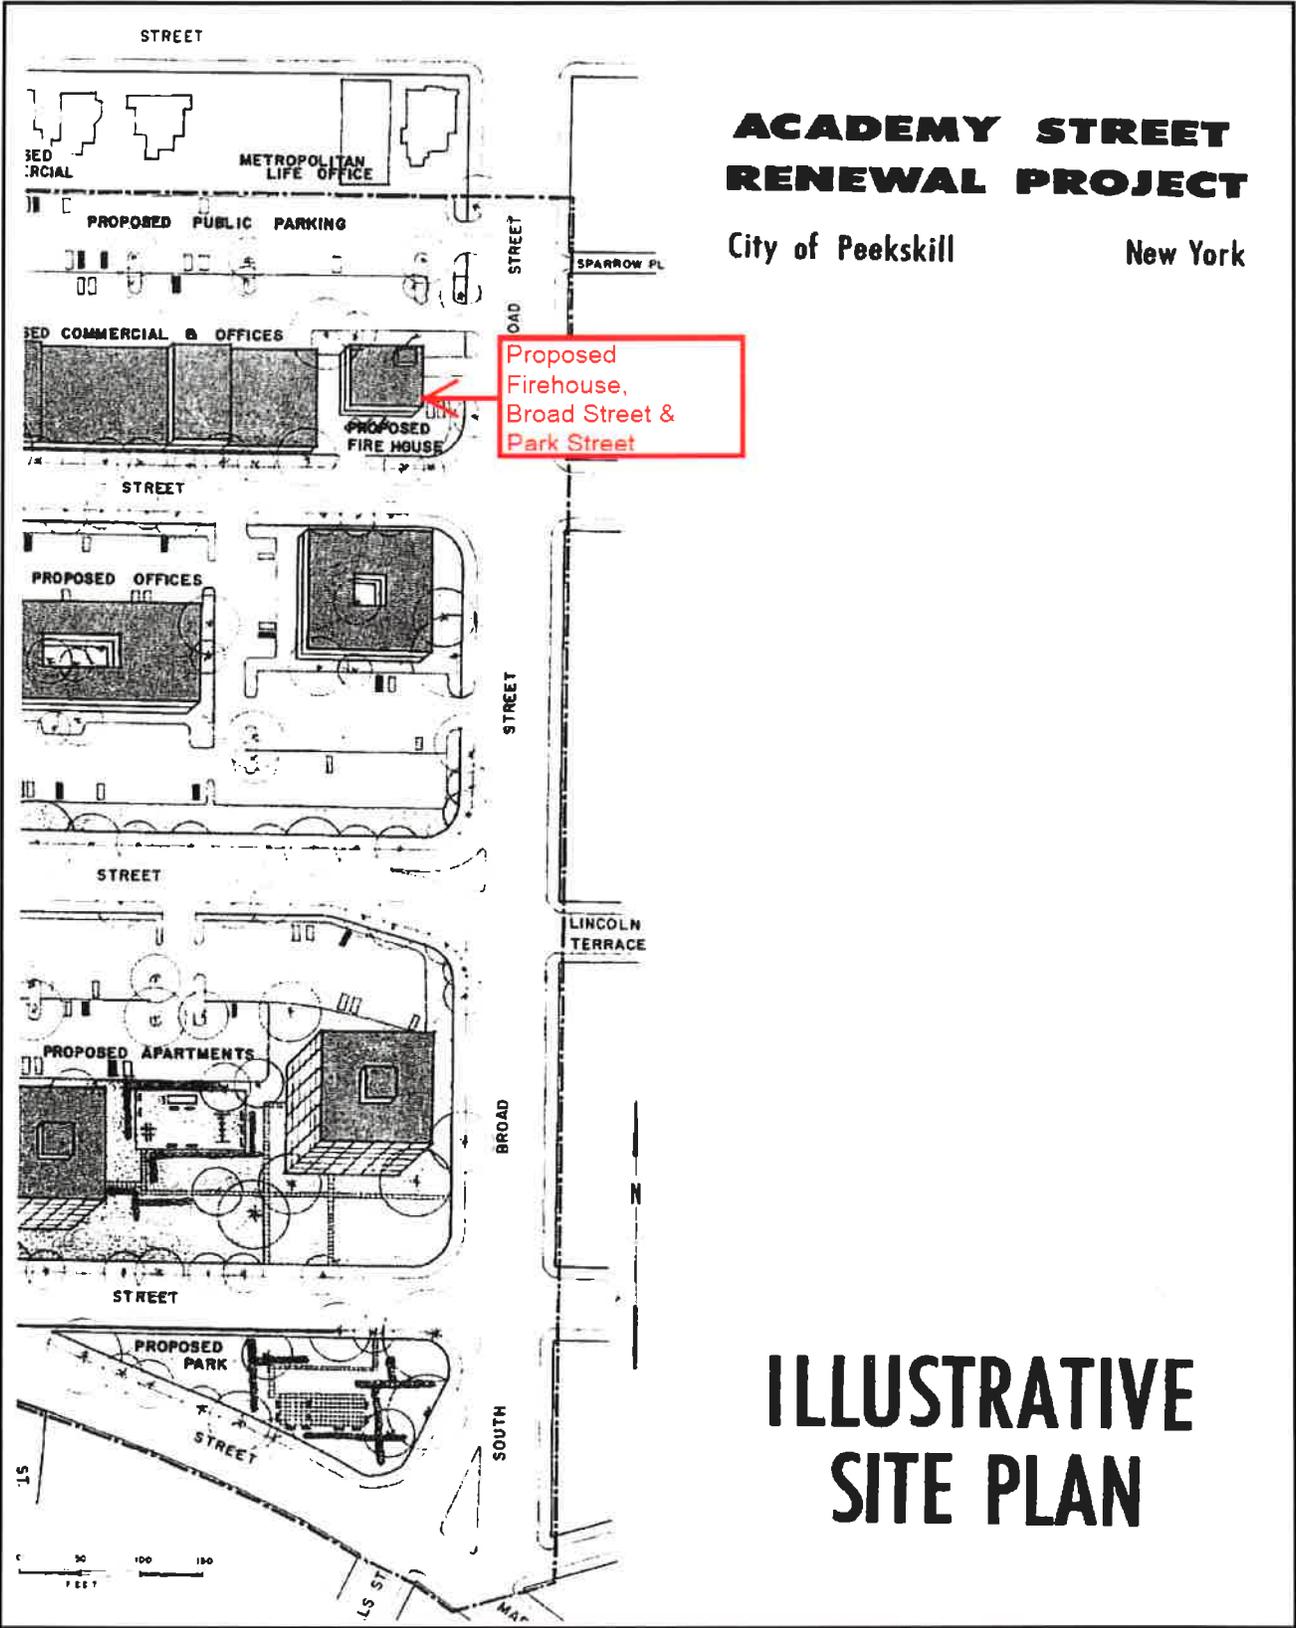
Academy Street Urban Renewal Project, Illustrative Site Plan
